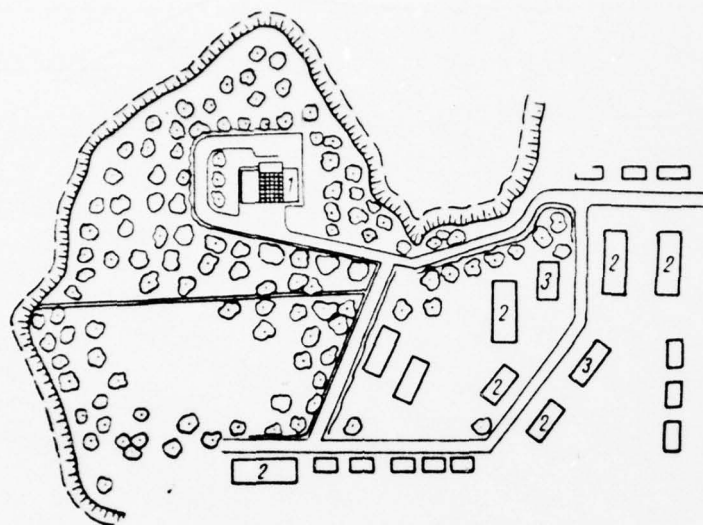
General plan of the strong point of TashGRES. 1 - the building of the station of QSS; 2 - 1-graduated buildings; 3 - 2-graduated buildings.
